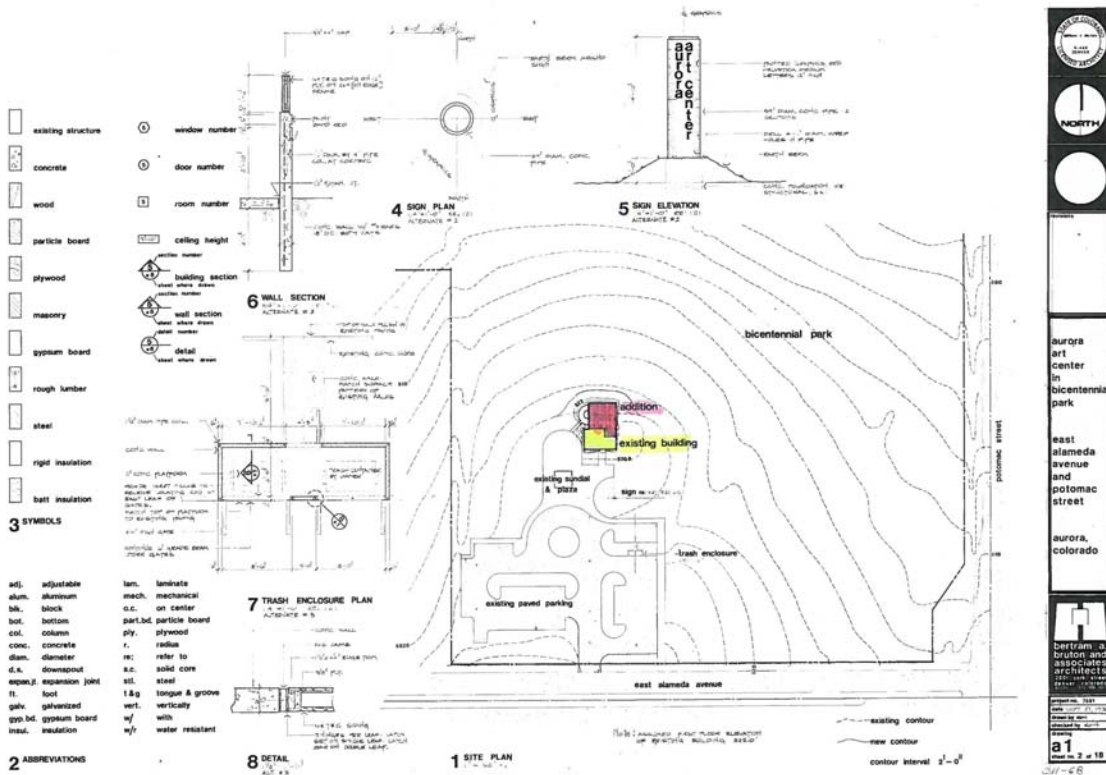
Architectural site plan of addition. 1976. Photograph courtesy Aurora History Museum archives.
